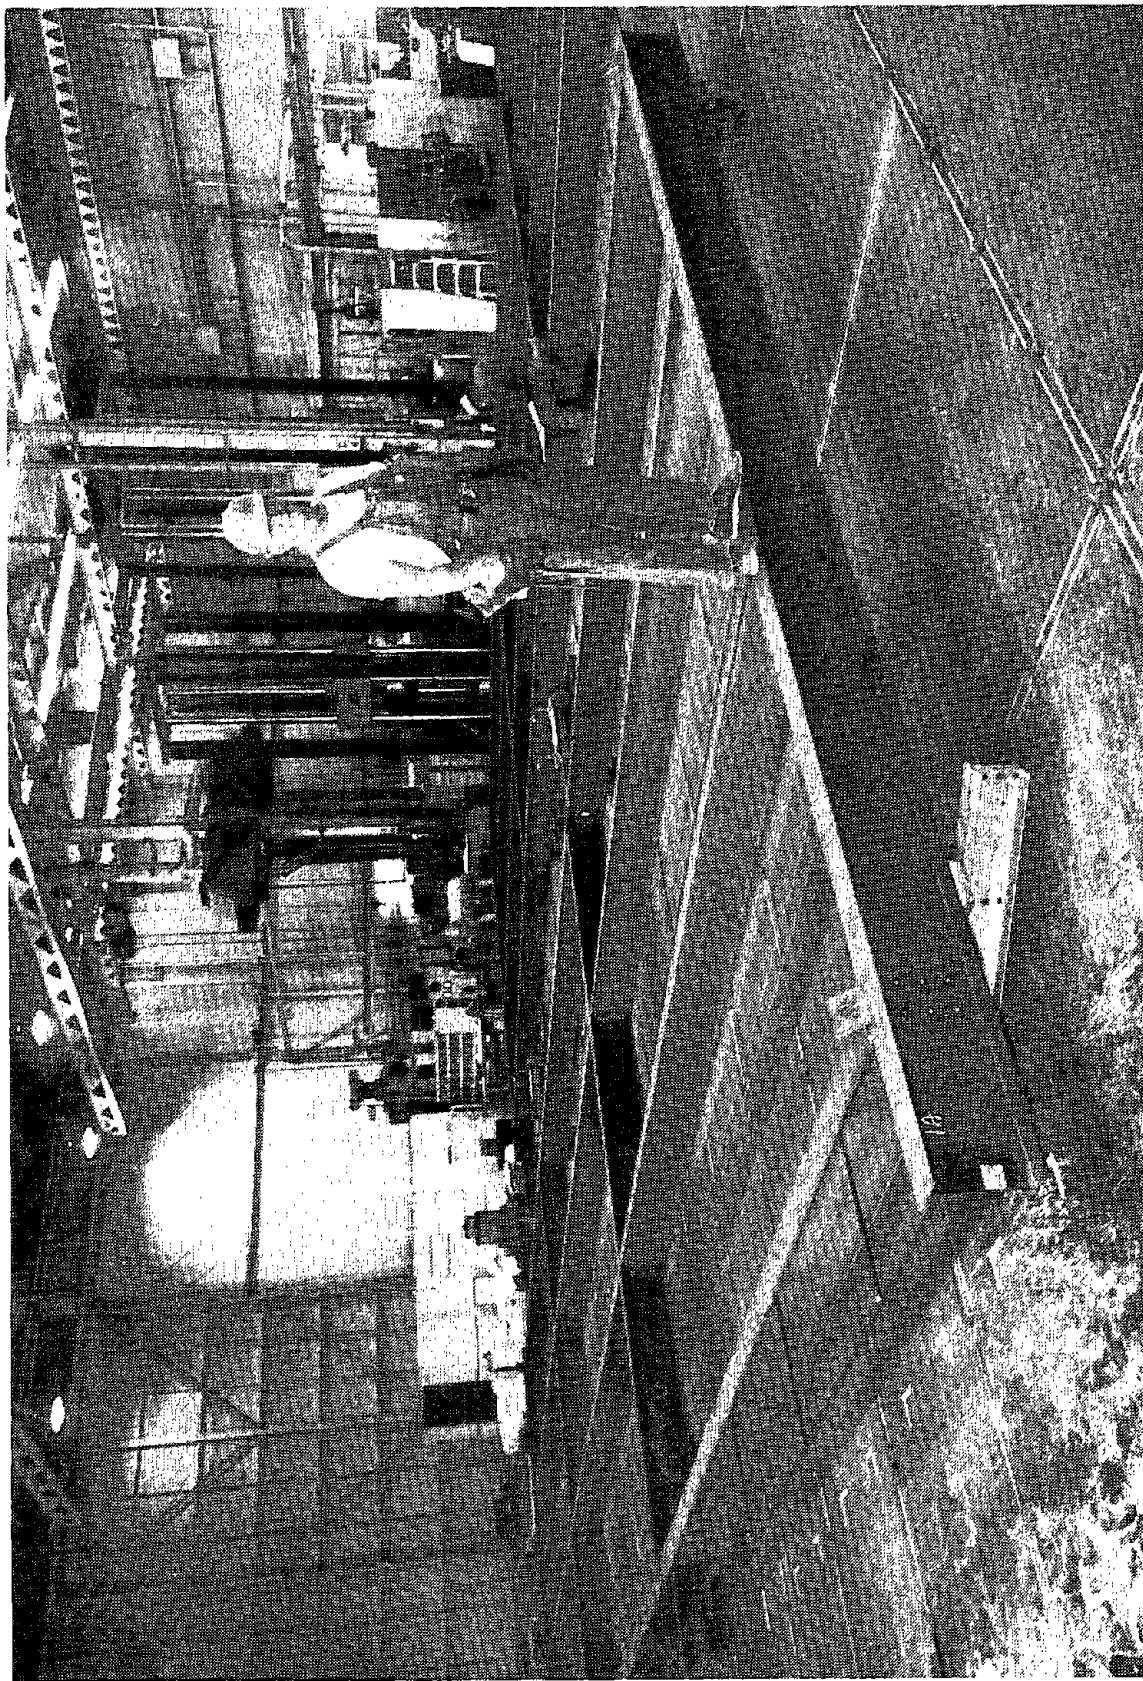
STEEL FRAMES FOR STEEL DECK DIAPHRAGMS.
